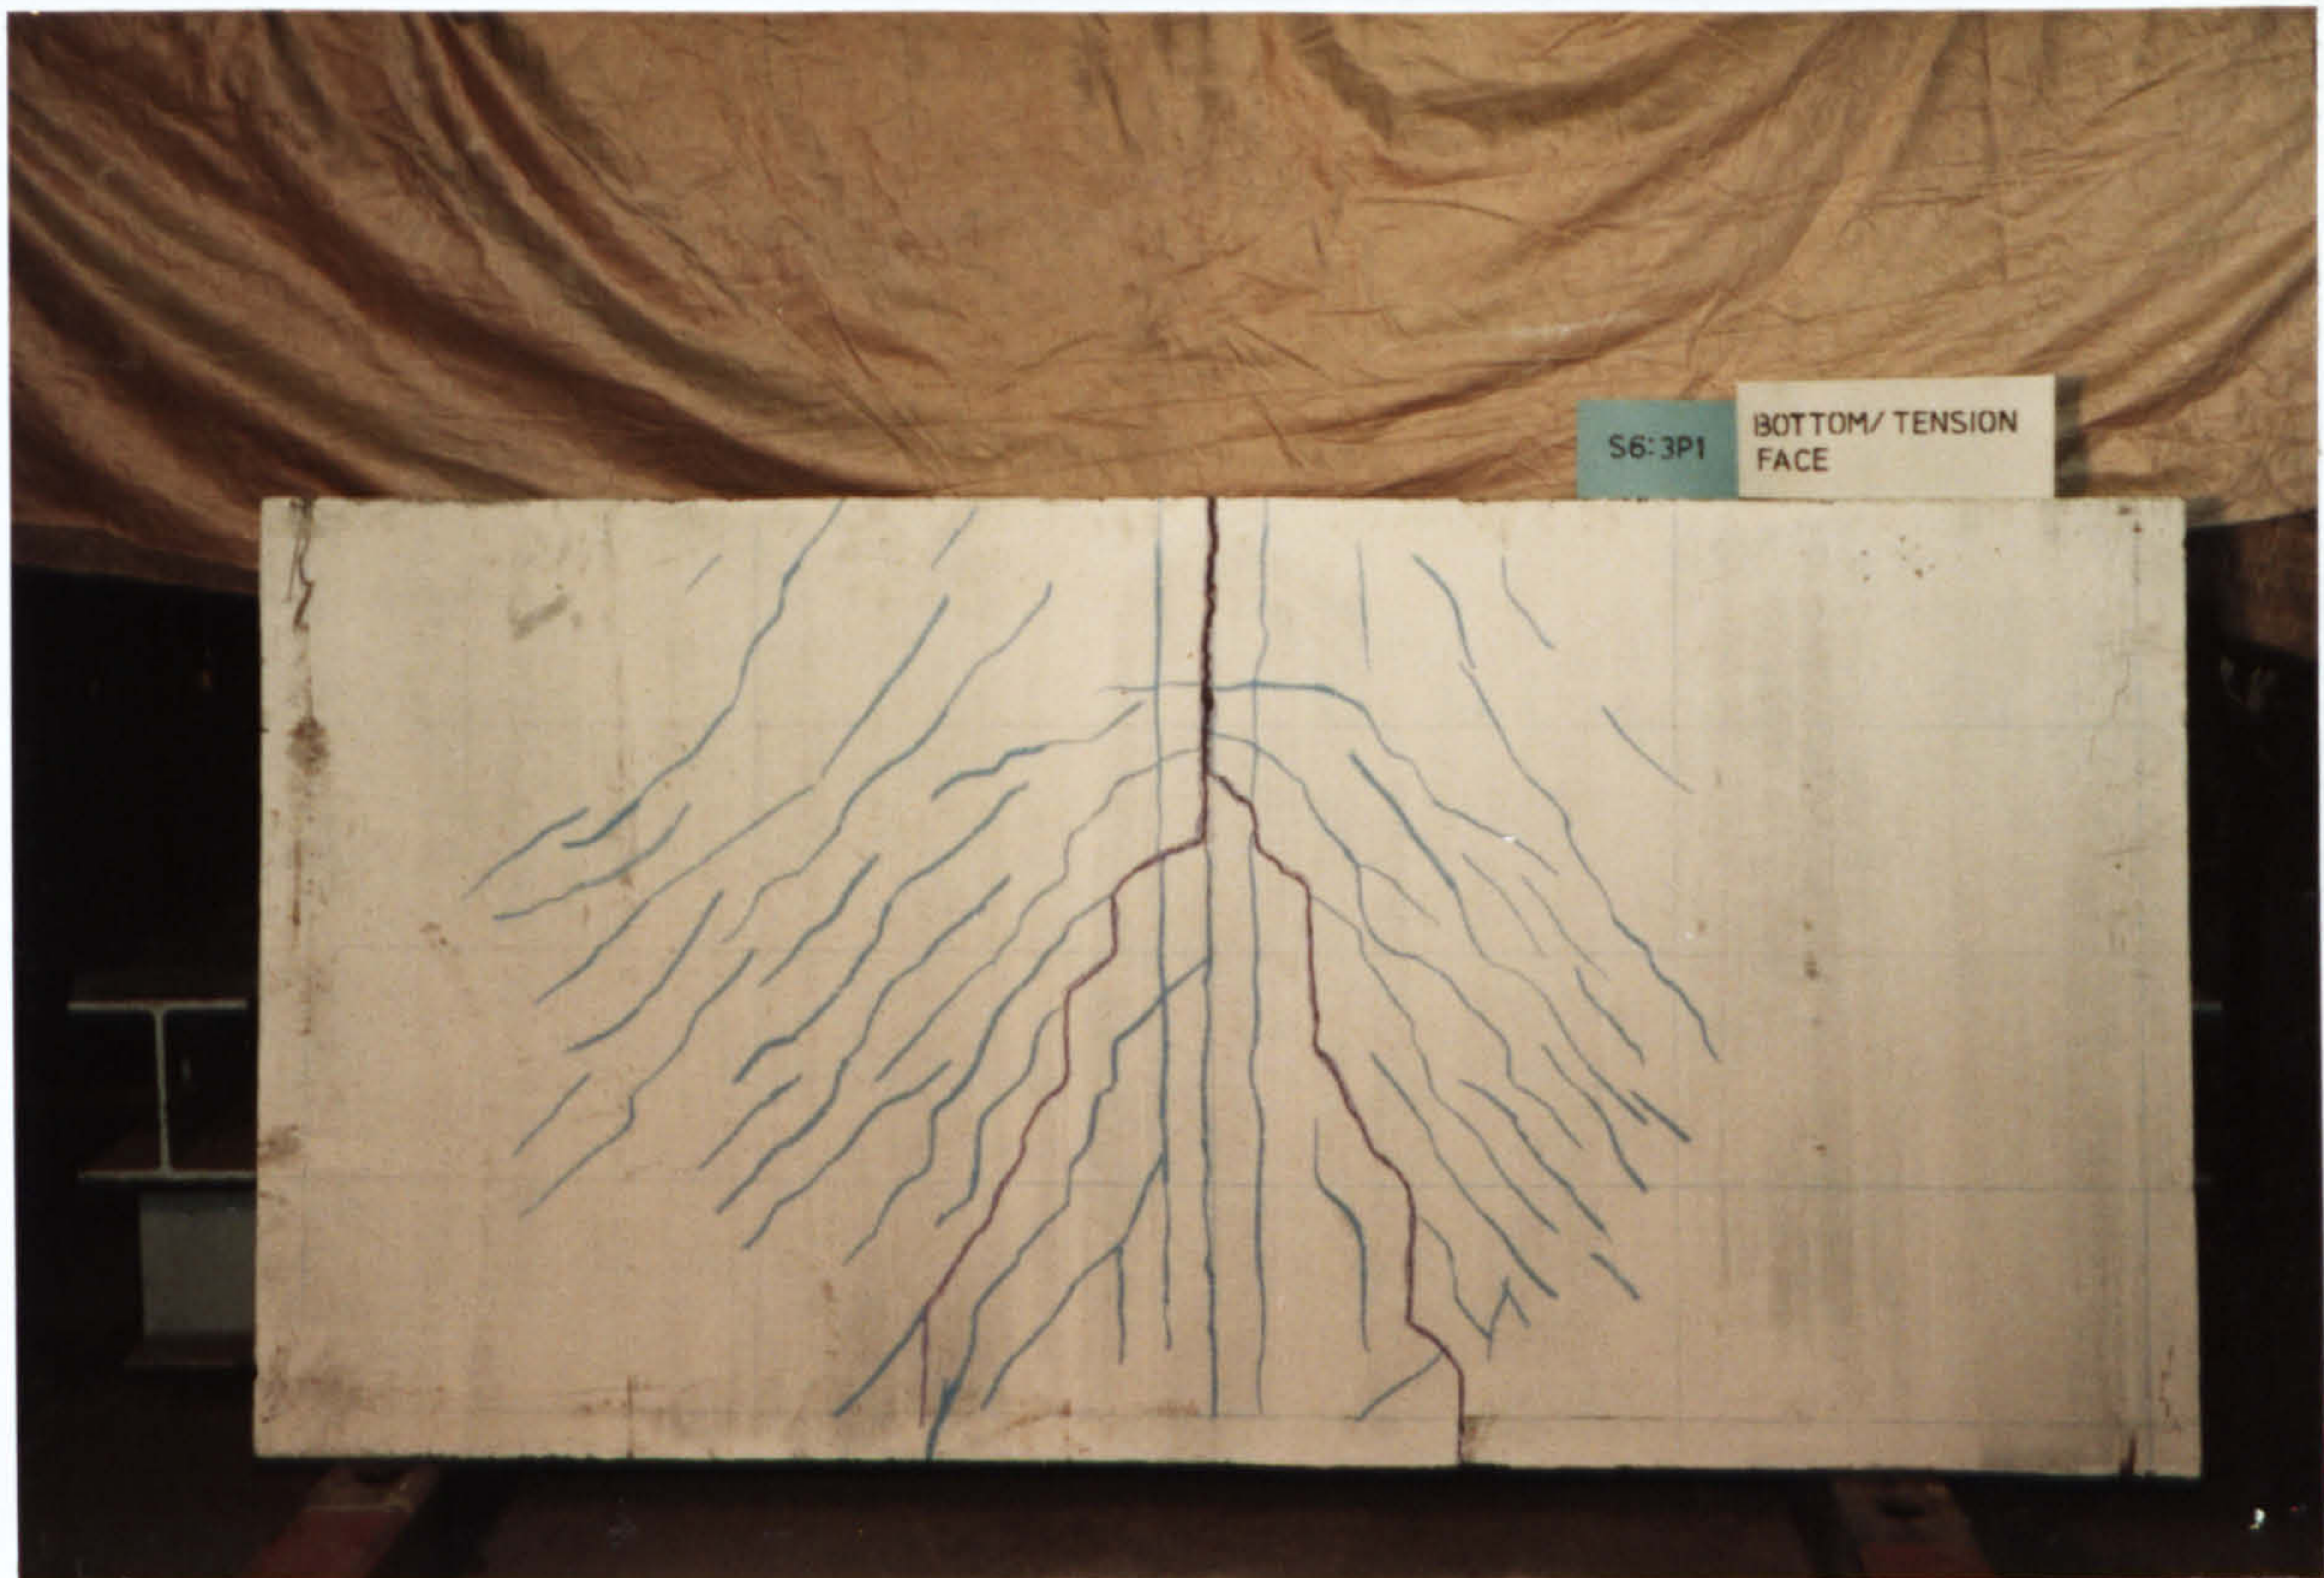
Crack Patterns at Failure on the Tension Face of Model S63P1.
